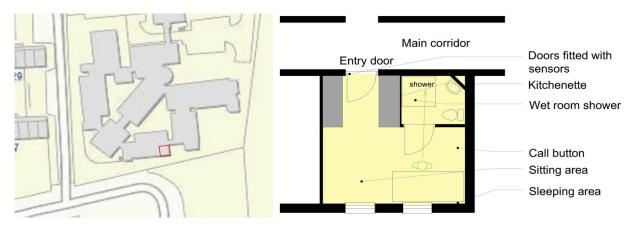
Typical layout of a ground floor unit in Anam Cara
